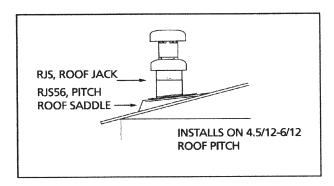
RJS56 ROOF SADDLE, HI PITCH ROOF
